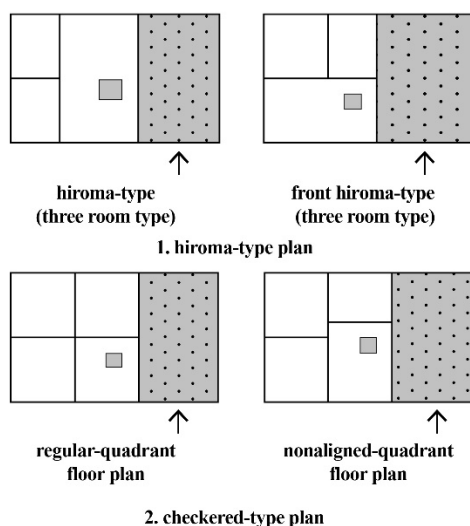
6 Two basic plan layouts has been emerged in minka.<sup>9</sup>
